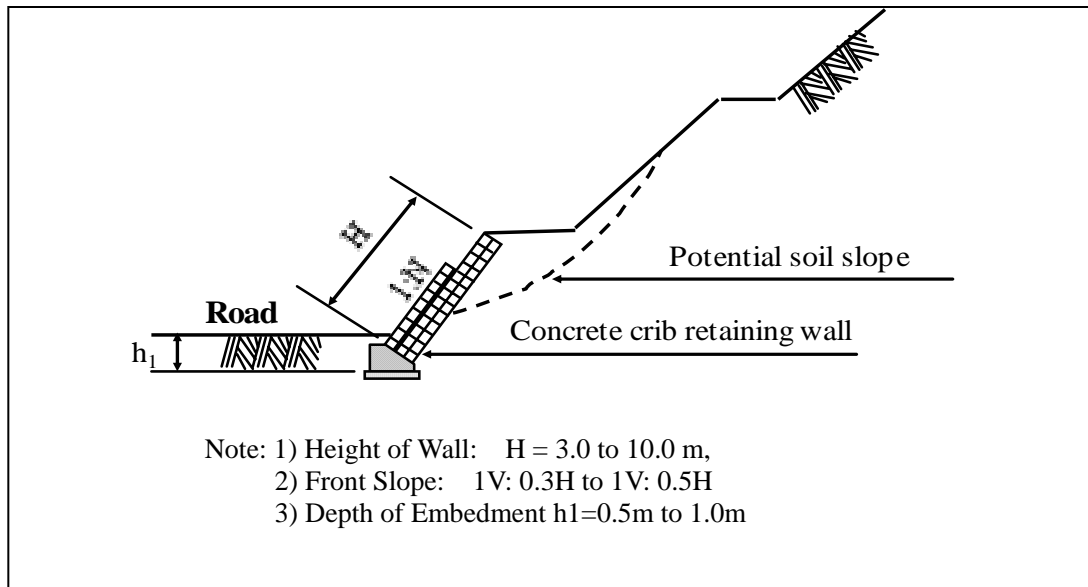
Detail of Concrete Crib Retaining Wall
